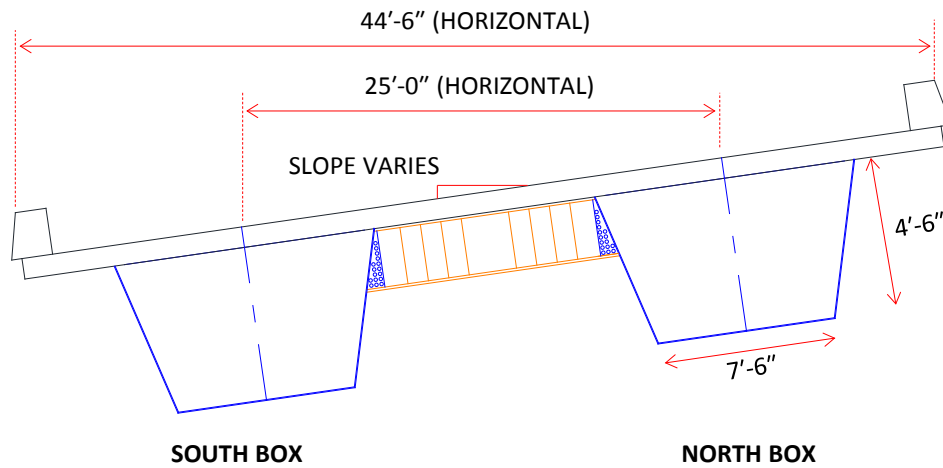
Dimensioned cross-section view of the I-5 Interchange Bridge.
